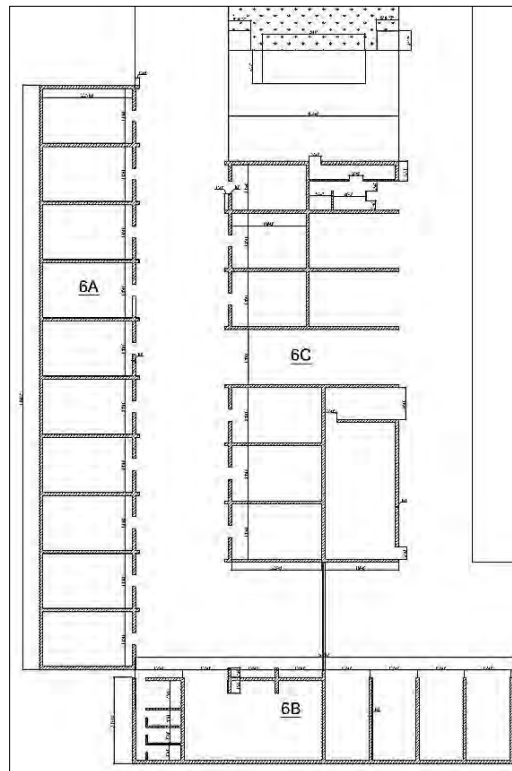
Plans of the Building No. 6A, 6B and 6C
